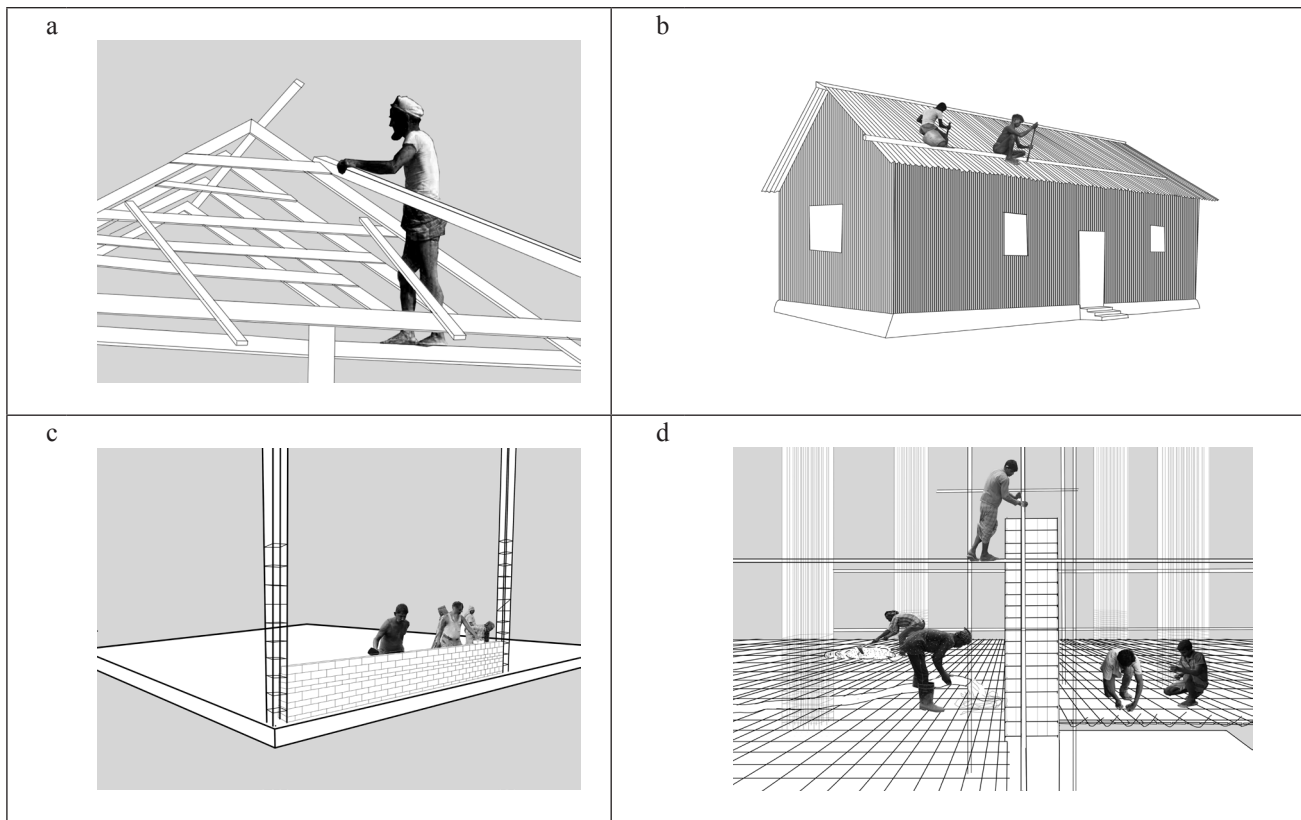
Construction of traditional rural houses (a, b) Contemporary rural house (c) and contemporary urban house (d)
